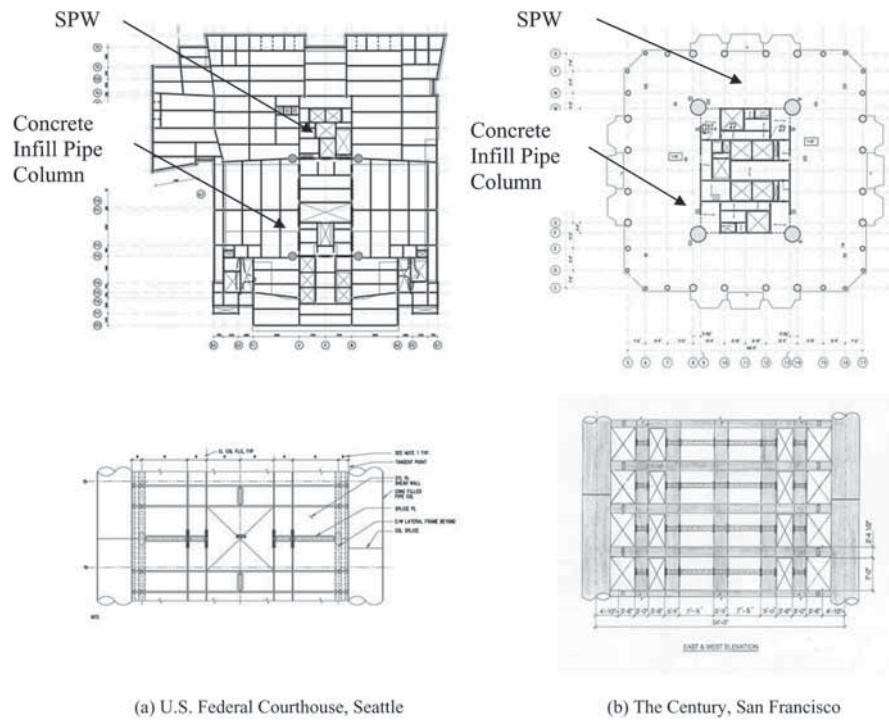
Core walls with composite concrete infill steel pipe columns (Seilie and Hooper, 2005).
